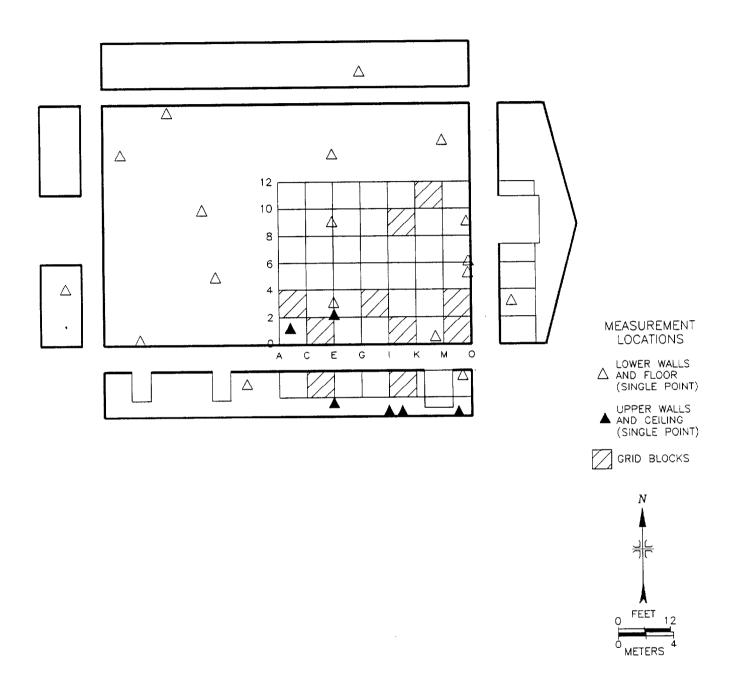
Layout of Machine Shop, Building 5, Indicating Measurement Locations
